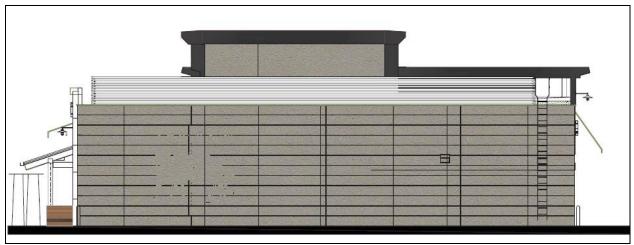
Proposed Site Plan Amendment- conceptual rendering South Elevation
